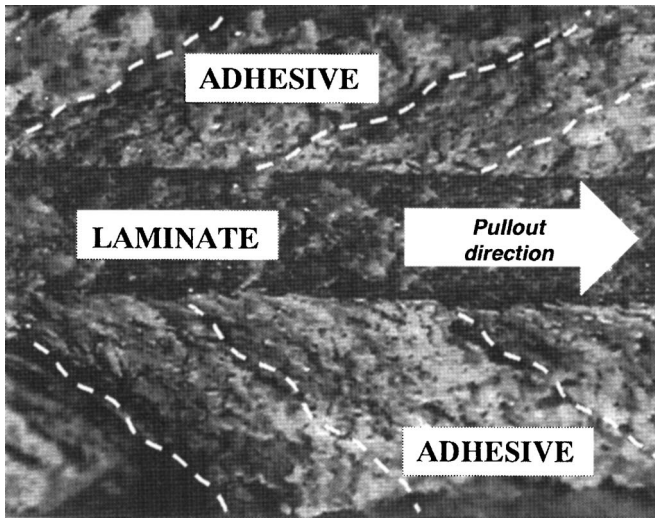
Crack pattern observed in laminate-adhesive-concrete bonding zone
